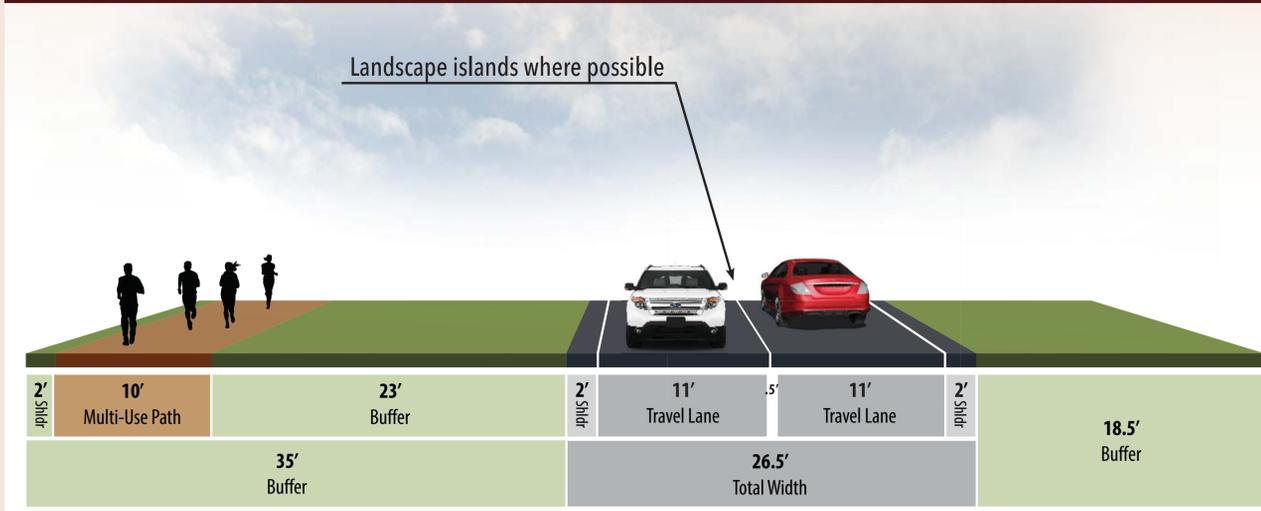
# PHOTO SIMULATIONS AND PROPOSED TYPICAL SECTION
